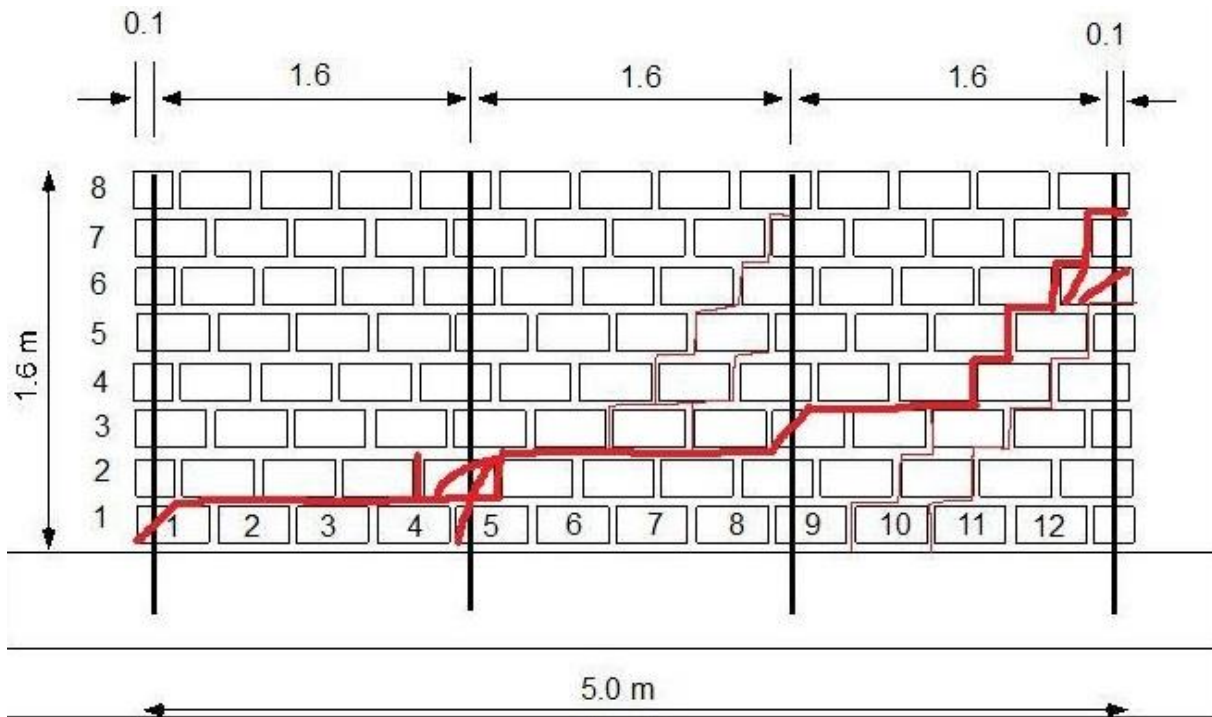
Cracking pattern: wall action (Shrive et al. (2009))
